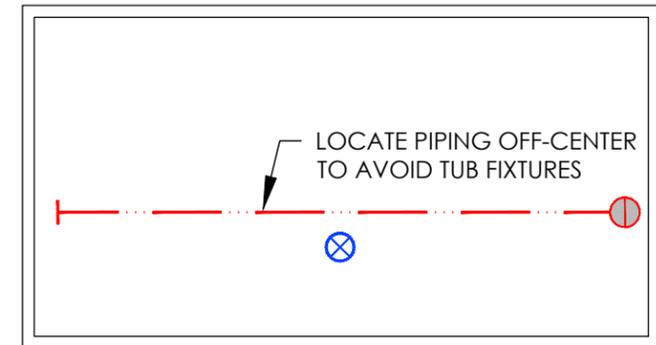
DETAIL A - TYPICAL SLAB AT PIPE CHASE
